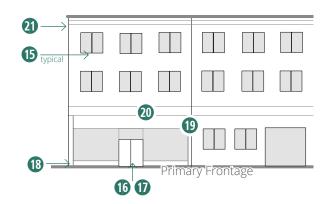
G-3. Workshop Building: Facade Design Requirements
